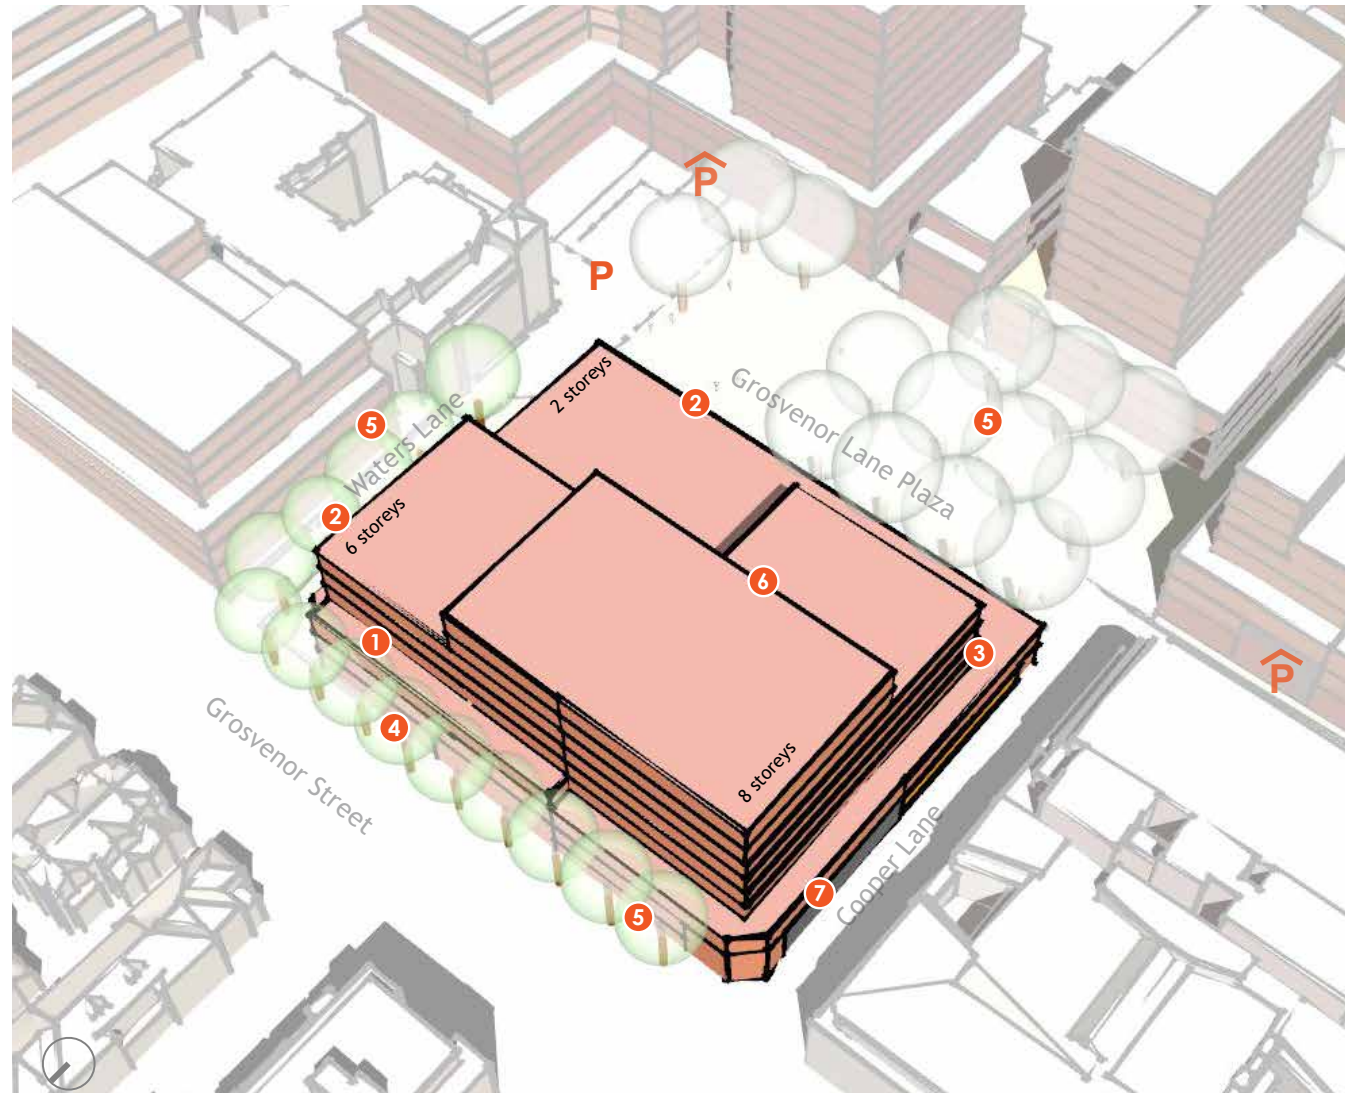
Illustrative building envelope looking south-east. Building height increases transition with the surrounding residential area and are in keeping with the character of Grosvenor Street. Additional tree planting along Grosvenor Street and upper level setbacks further limit the visual impact.
